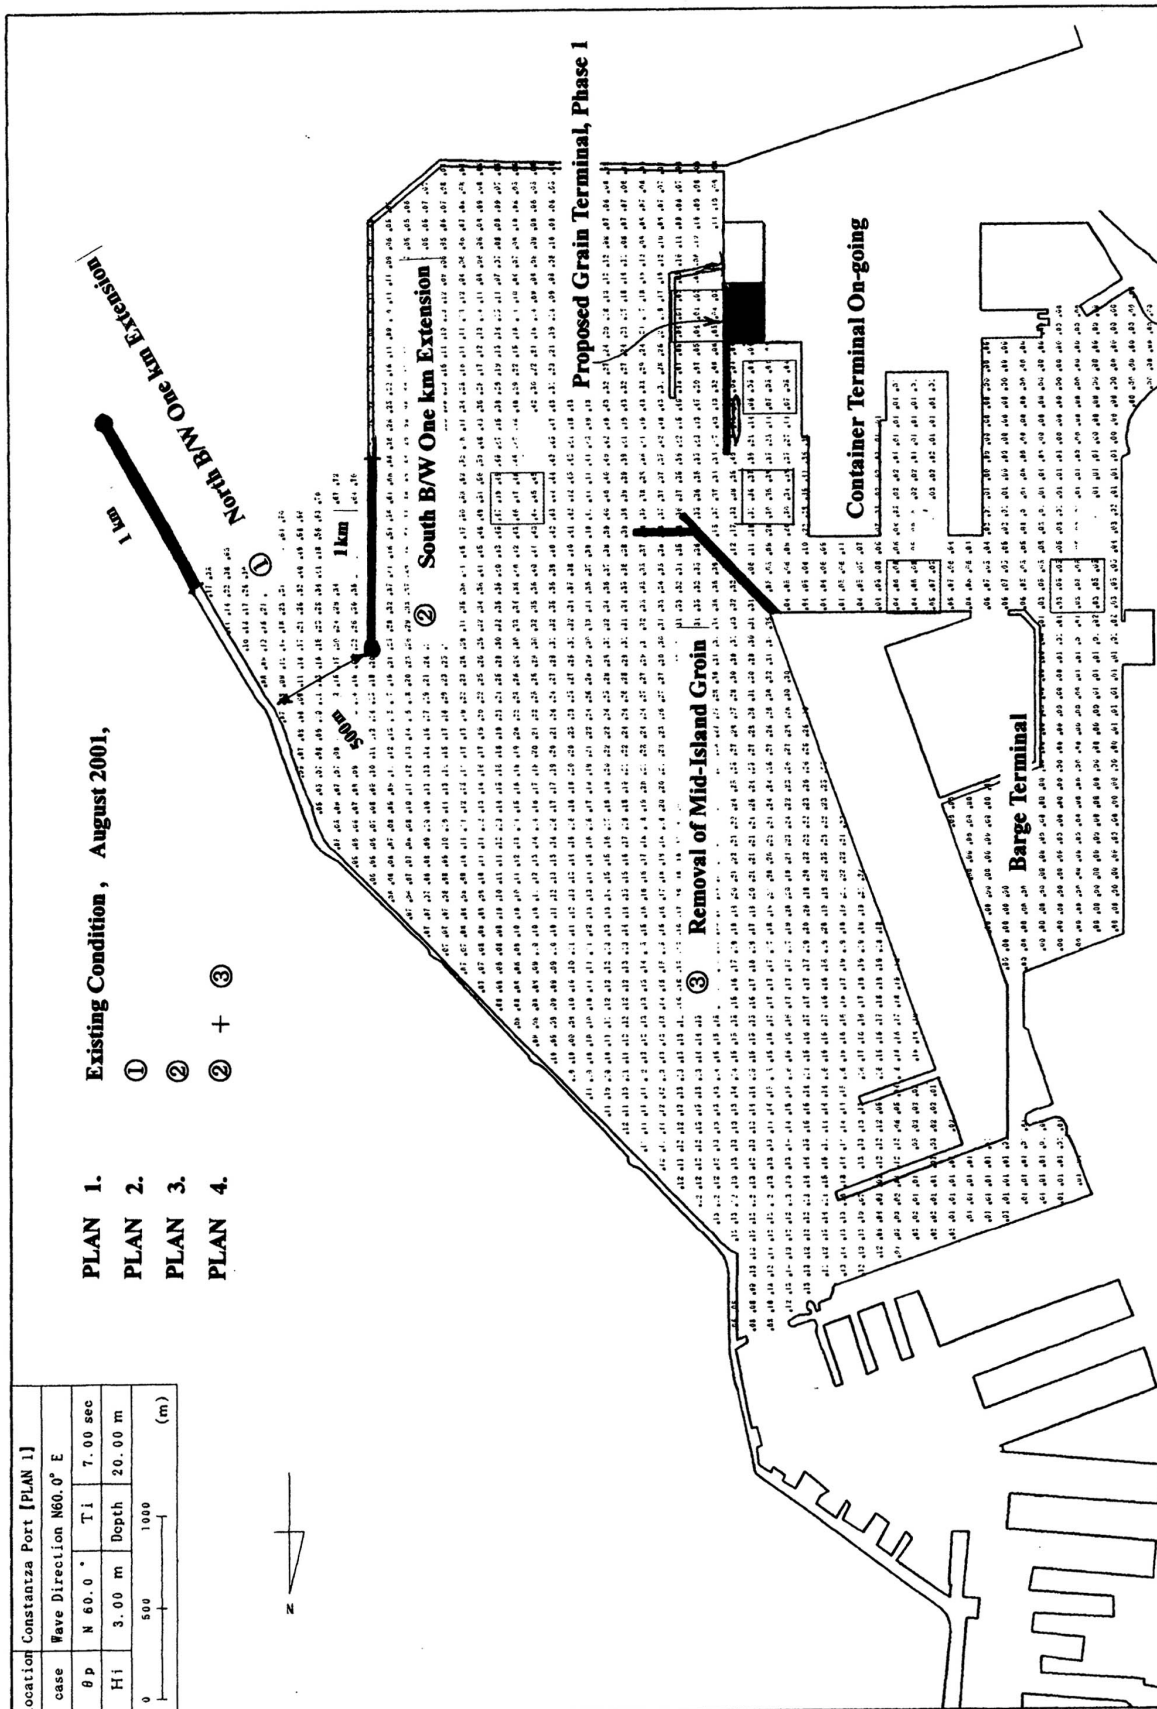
Possible Breakwater Combination in Alternative Plans
